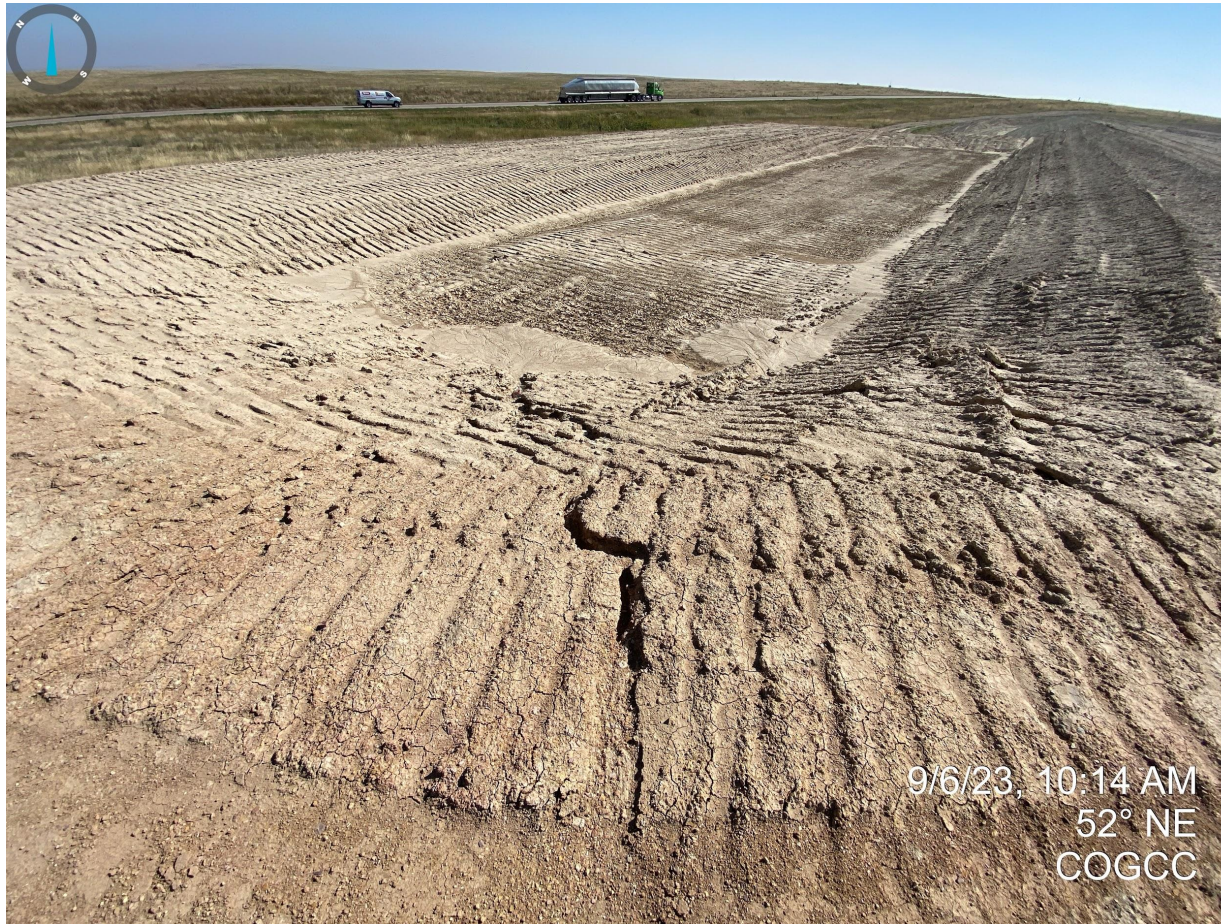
Taken from the sediment trap on the northern portion of the location. Photo illustrates erosion degradation (e.g. rilling) occurring from improper temporary stabilization techniques (equipment tracking that is parallel to slope). The sediment trap did not have any apparent inflow or outflow protection measures in place at the time of this inspection.
